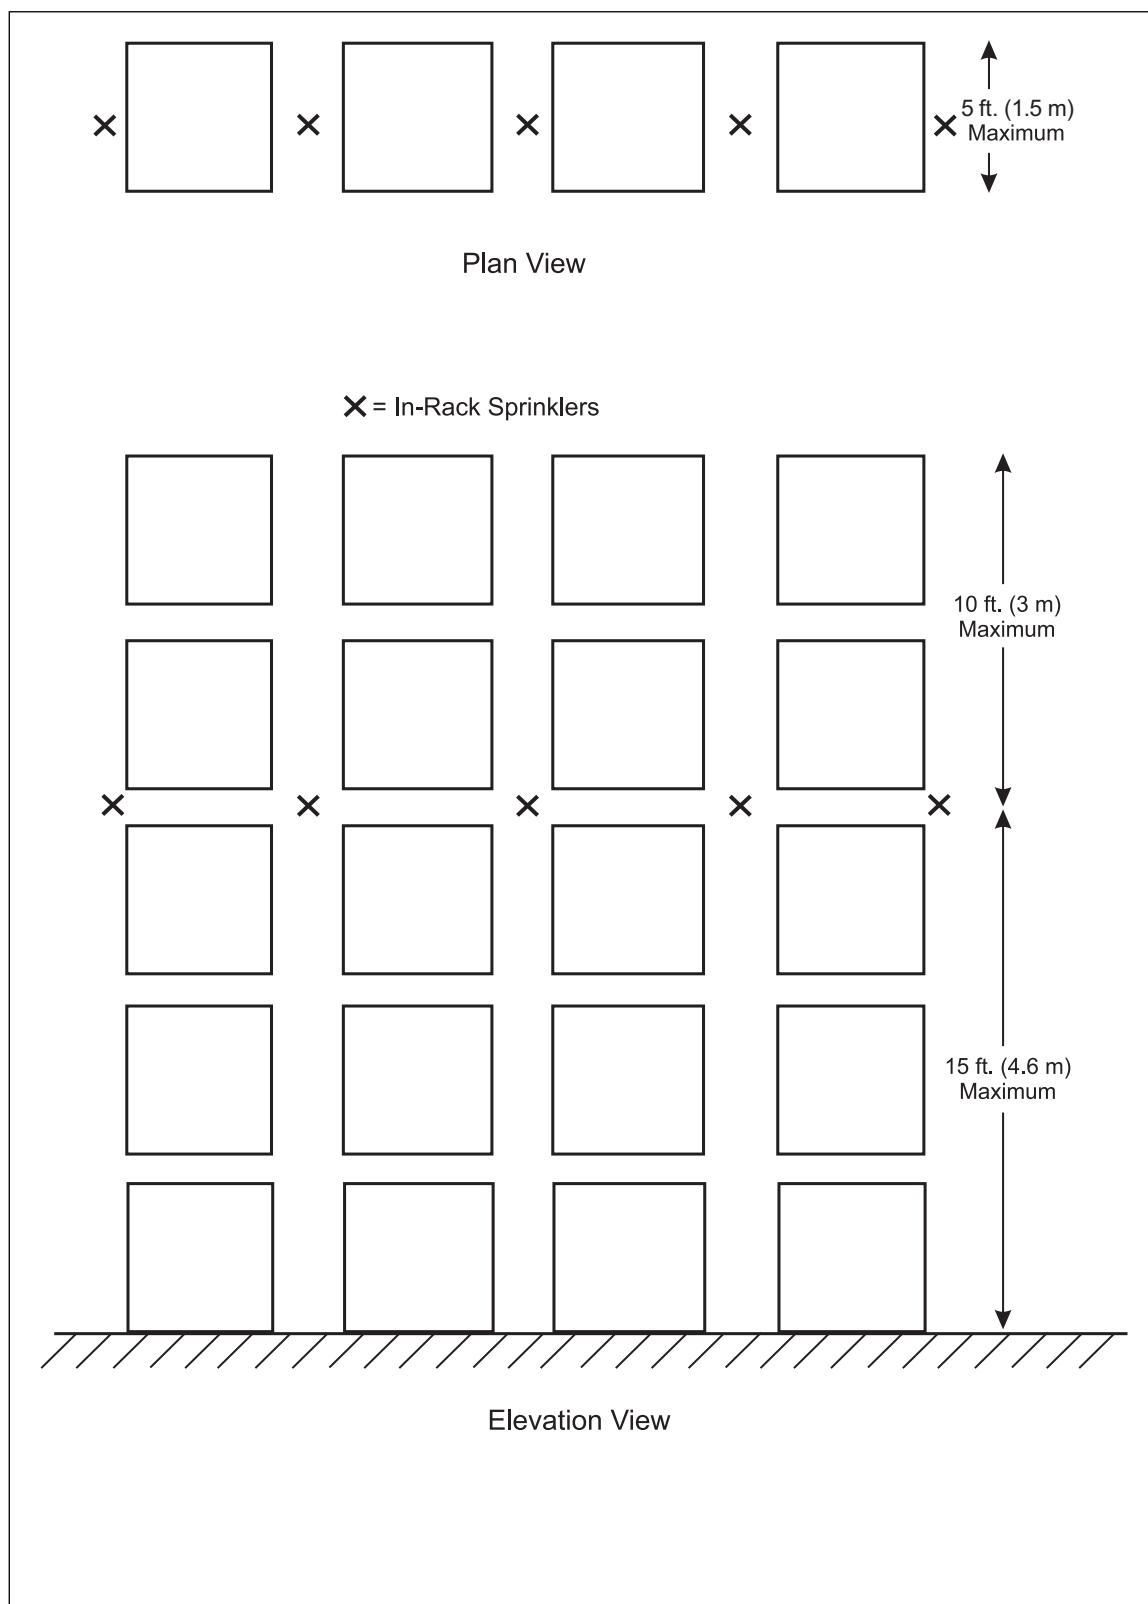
Single-row rack sprinkler layout: quick response sprinklers protection scheme
